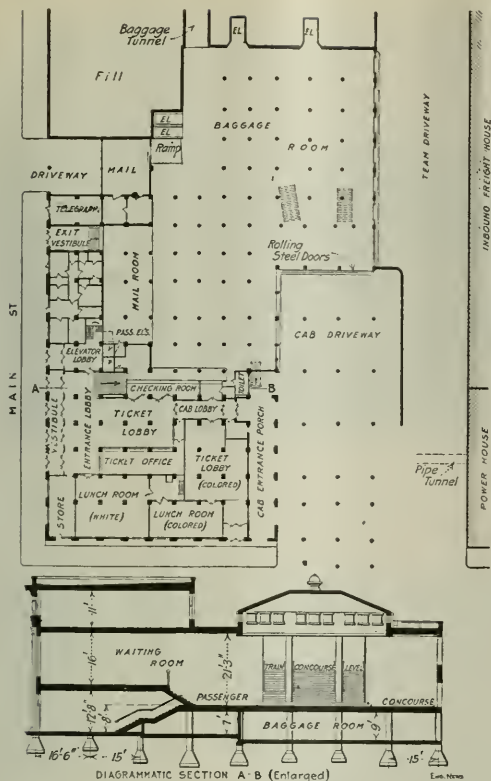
PLAN AND CROSS-SECTION OF STATION BUILDING
